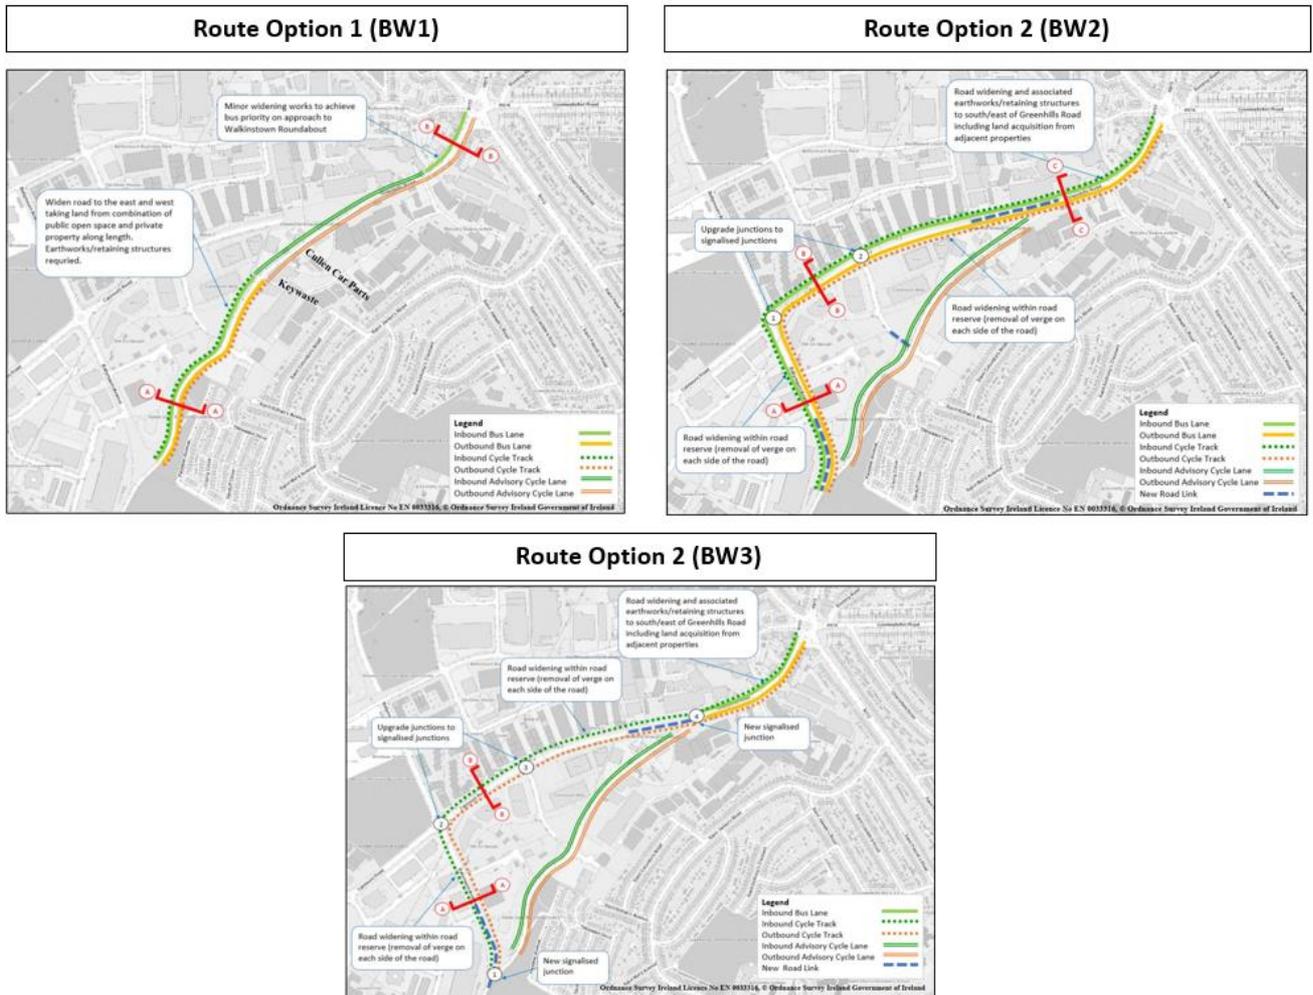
Alternative Options between Ballymount Avenue and Walkinstown Roundabout
